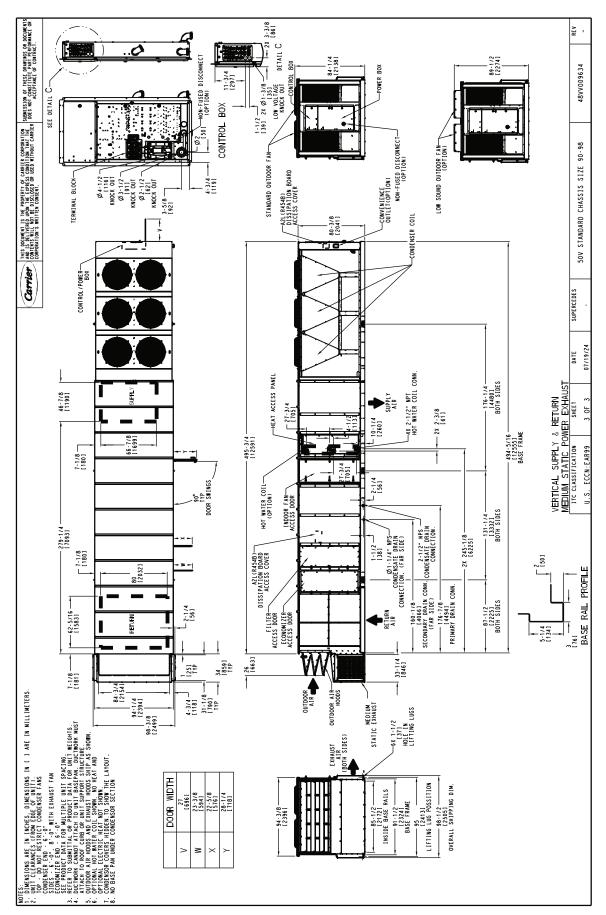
50V 90-100 Ton Standard Chassis (cont)
